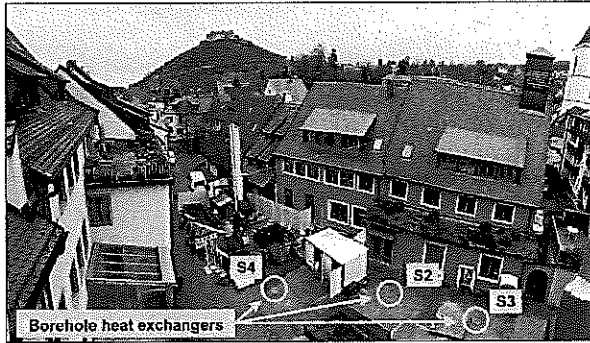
Borehole heat exchanger field at Rathausgasse with drill rig for the first exploration boring for determining the cause of damage (March 2009). Photo taken from the tower of the town hall by U. Burbaum.
